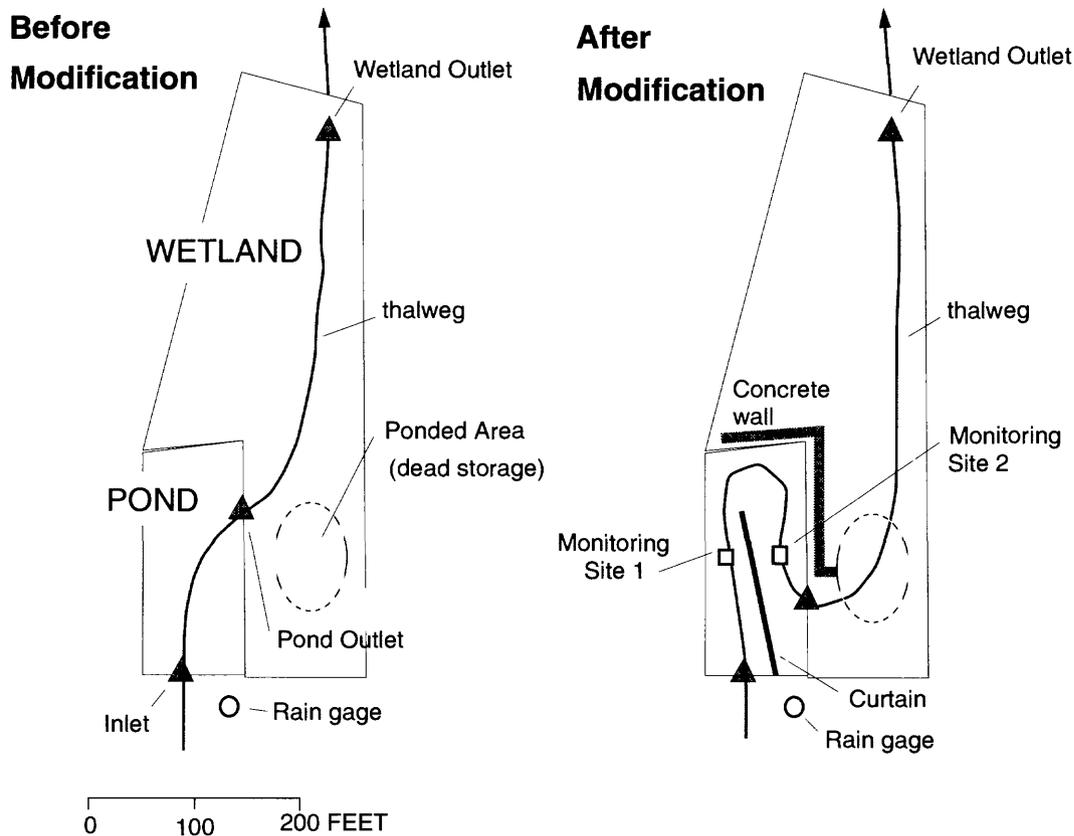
Plan view of pond and wetland before and after modification. (Thalweg shows rerouting of stormwater after modification.)
